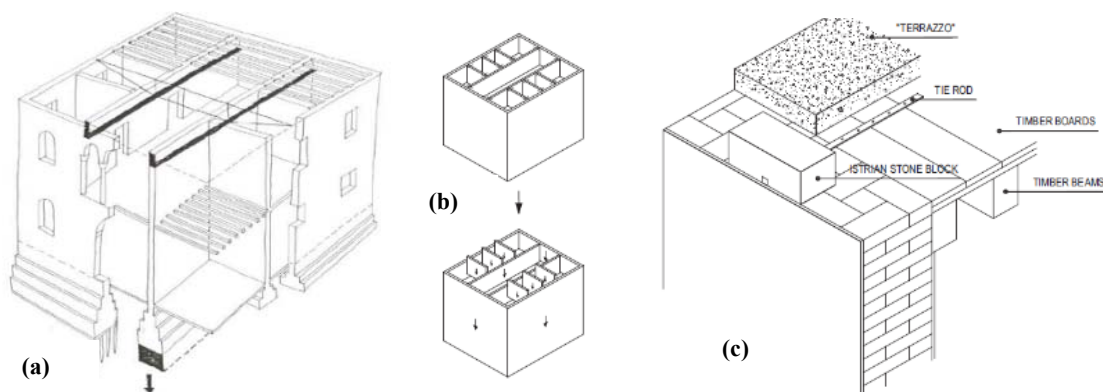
Description of the structural layout of the Venetian Fabrique: a) example of *casa da stazio* from the foundation to the floors ; b) Relationships between the longitudinal and transverse walls of Venetian building; c) typical scheme of horizontal diaphragm and connection between the vertical one.
